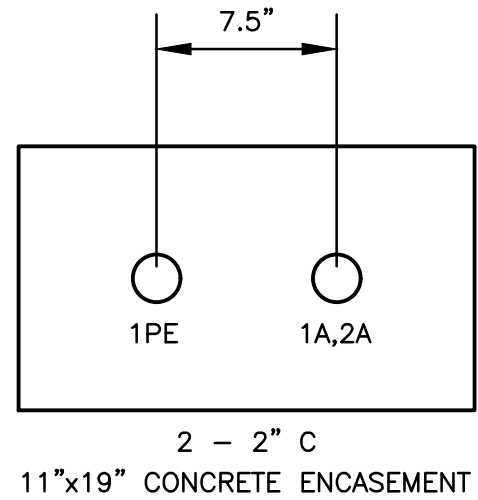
/E13 – QUARRY CONTROL BUILDING
